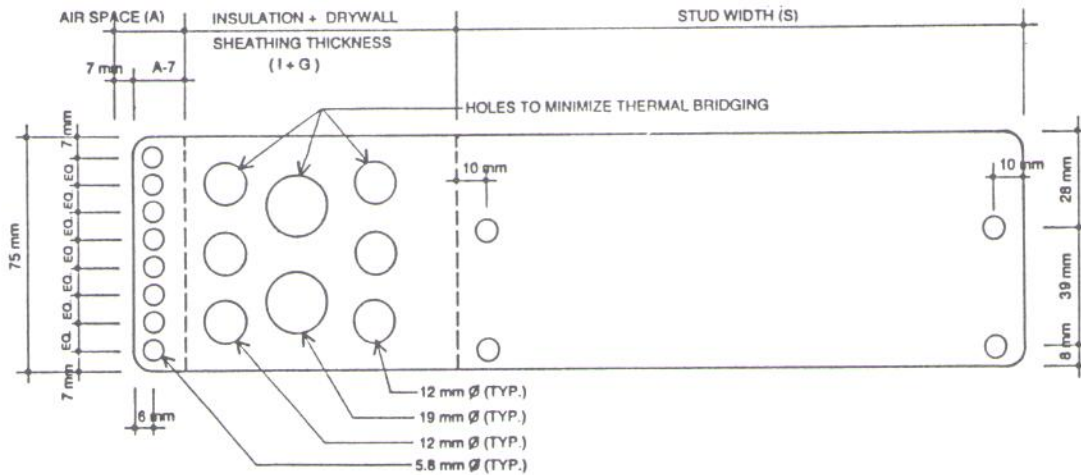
Dimensions of Shear Connector Plate used to attach the Web of the Steel Stud
